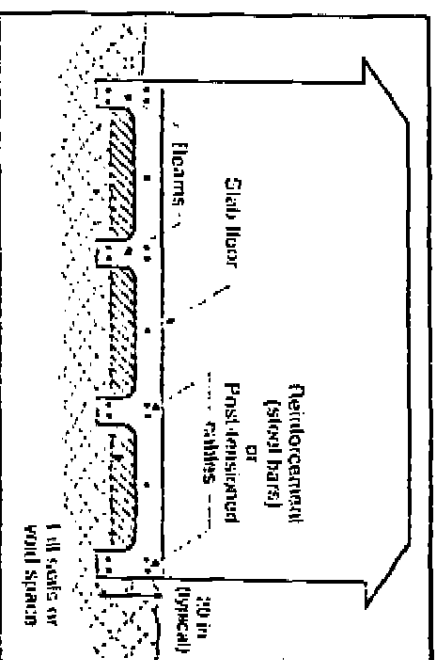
Post-tensioned slab-on-grade foundation. The bottom of the slab has a waffle-like pattern of longitudinal and transverse beams that extend downward a foot or more below the slab.
